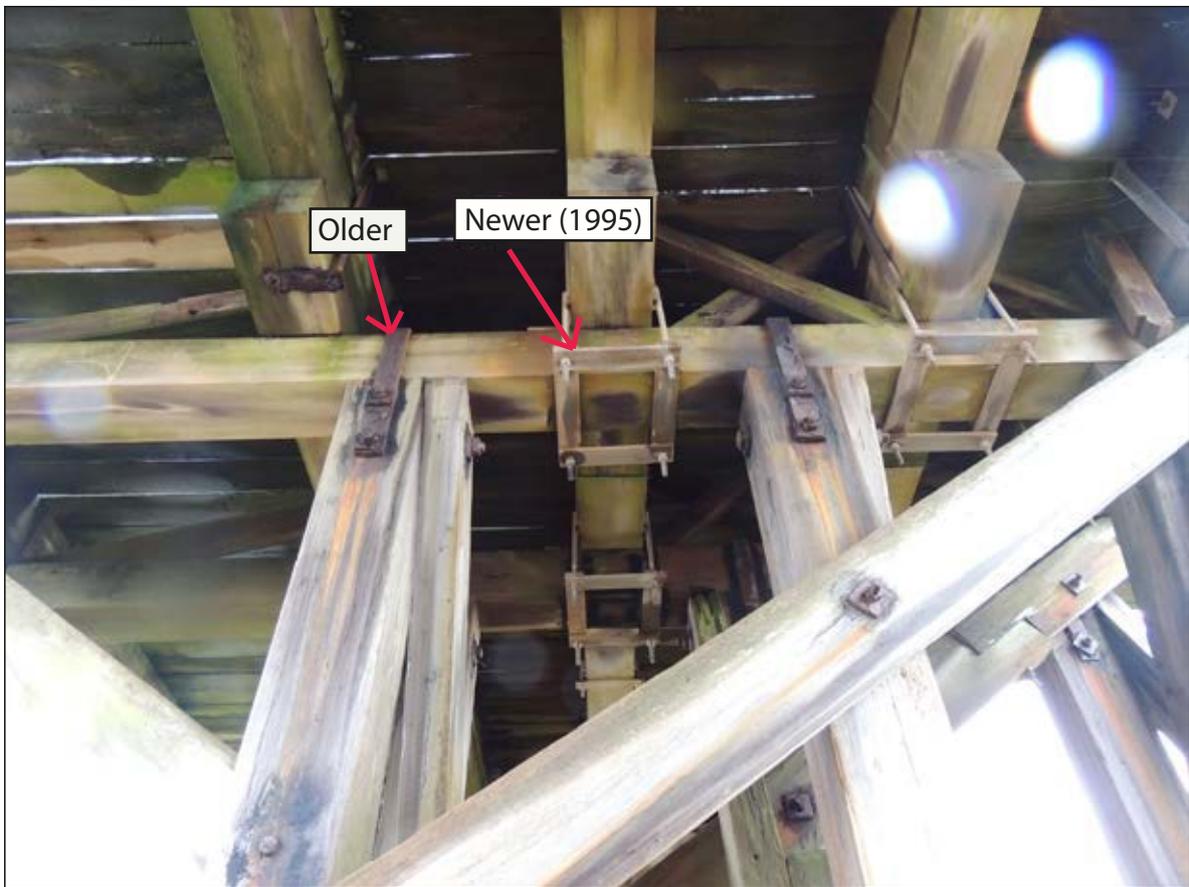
Shot of steel galvanized straps attached to support beams for transverse deck planks at trestle 2.
